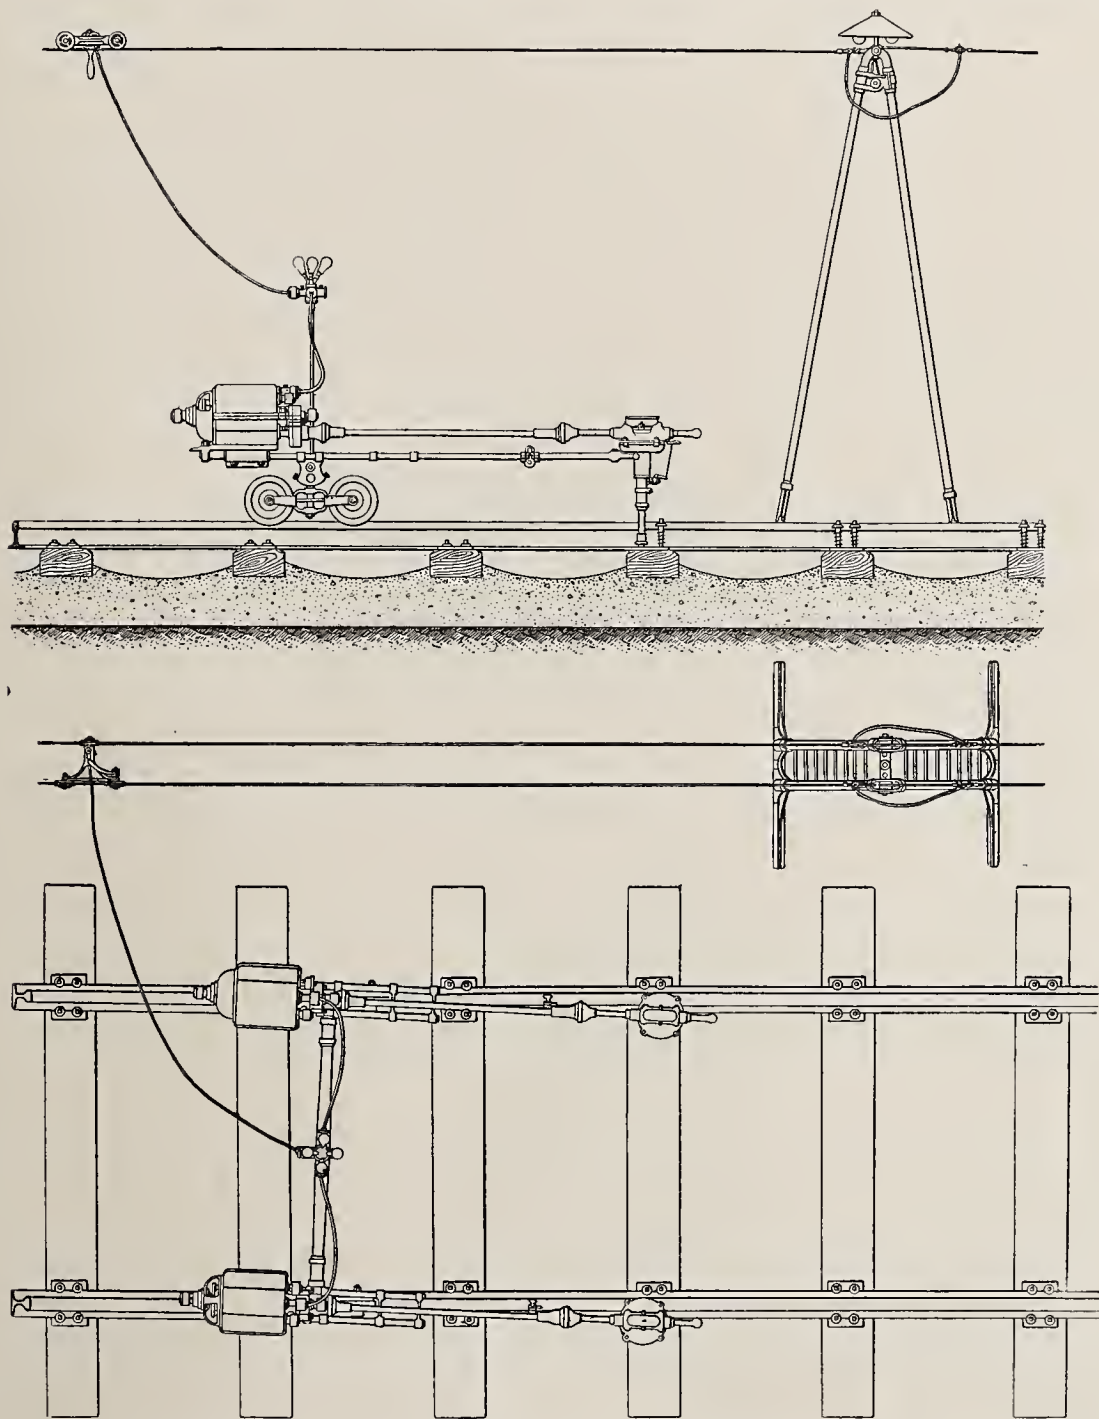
ELEVATION AND PLAN SHOWING COLLET'S SCREW SETTING MACHINE ON A LARGER SCALE, AND ALSO MORE CLEARLY EXPLAINING THE ARRANGEMENT OF THE TRANSMISSION LINE SUPPORTS
